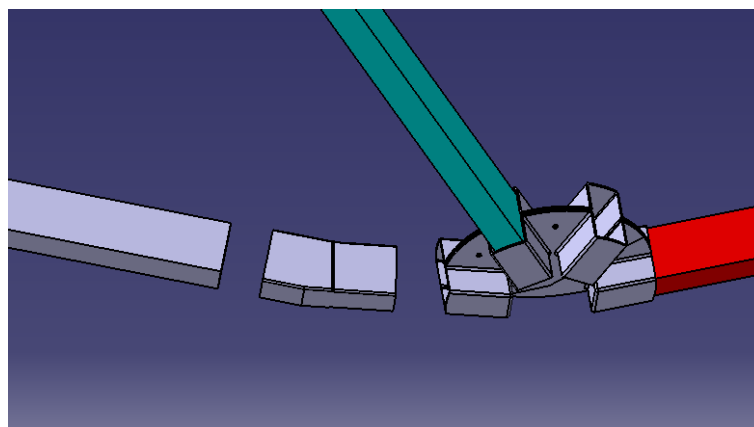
Mounting scheme for door joint and door rod with the structure.
